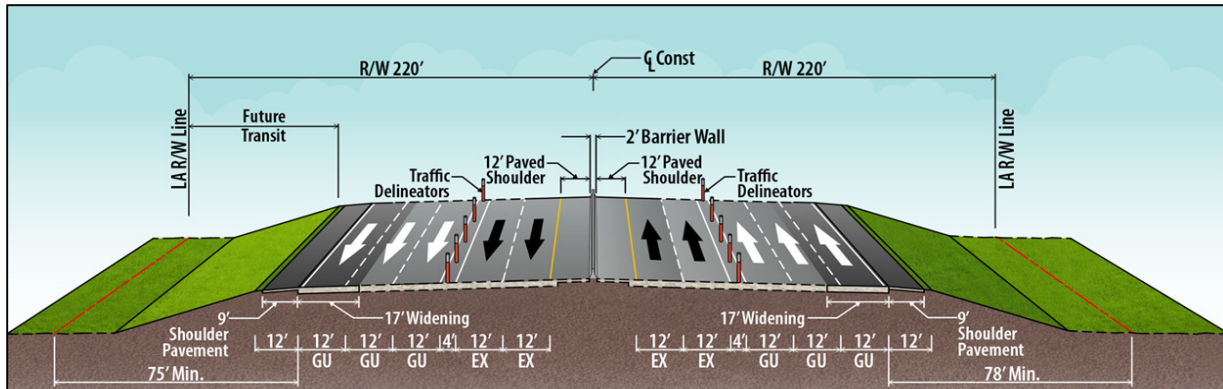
I-275 Mainline Master Plan Build Alternative Typical Section from south of Gandy Boulevard to Roosevelt Boulevard (Segment C-MP1)
